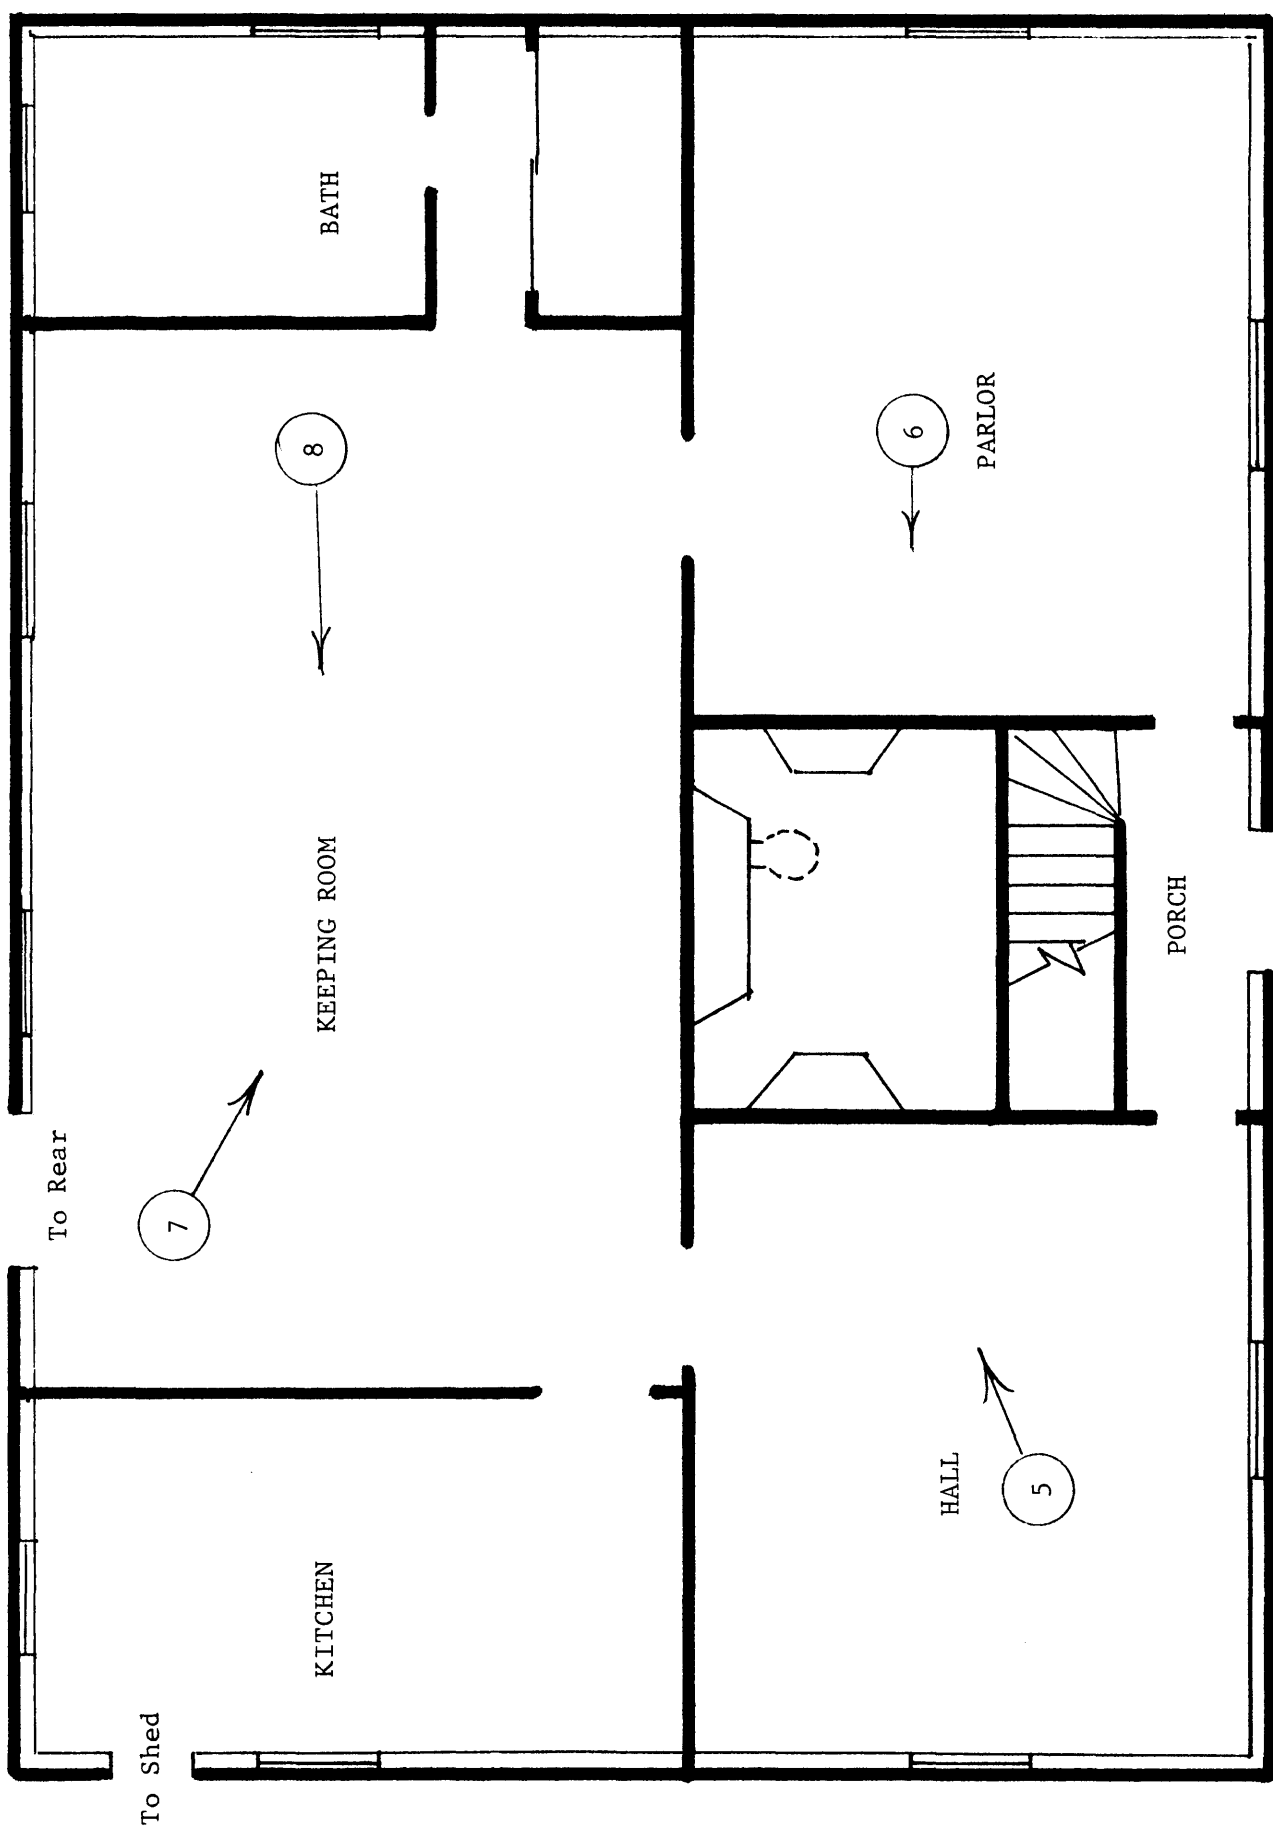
EXHIBIT B: William Ward, Jr. House - 1st Floor Pla
